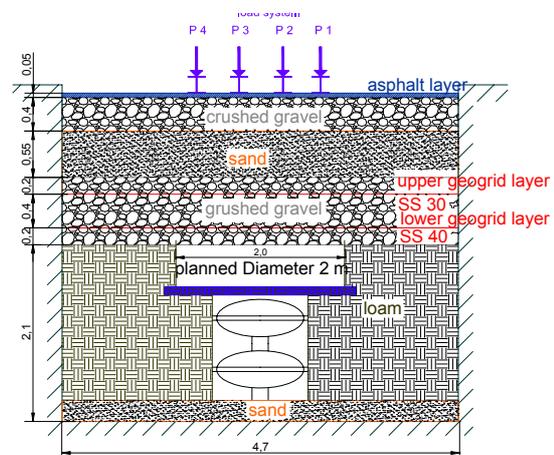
Longitudinal section of the trial arrangement with double-layer geogrid reinforcement.
